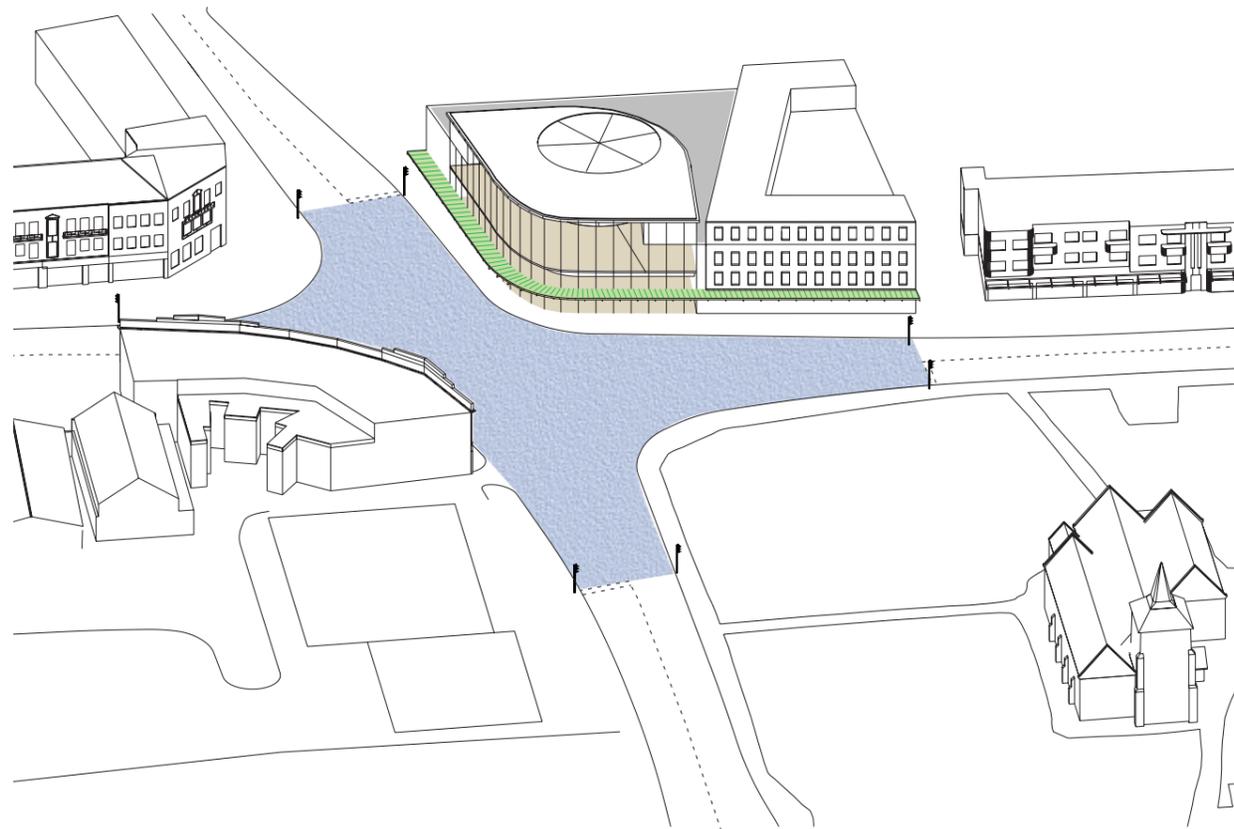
Bell Corner new build: perspective view of proposed work centre combining start-up workspace, apartment hotel and restaurant/bar
